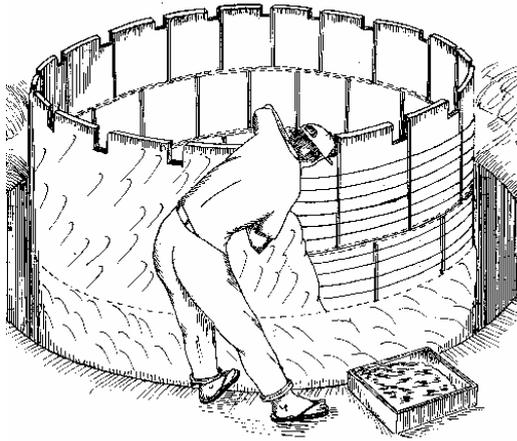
Fitting of the wall and outside plastering of cement plate cistern
